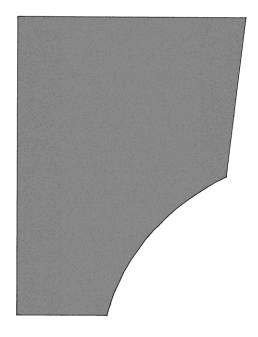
Cross section of upper floor joist 12 between lower joists 1 and 2. Height 130mm, maximum width 100mm.
